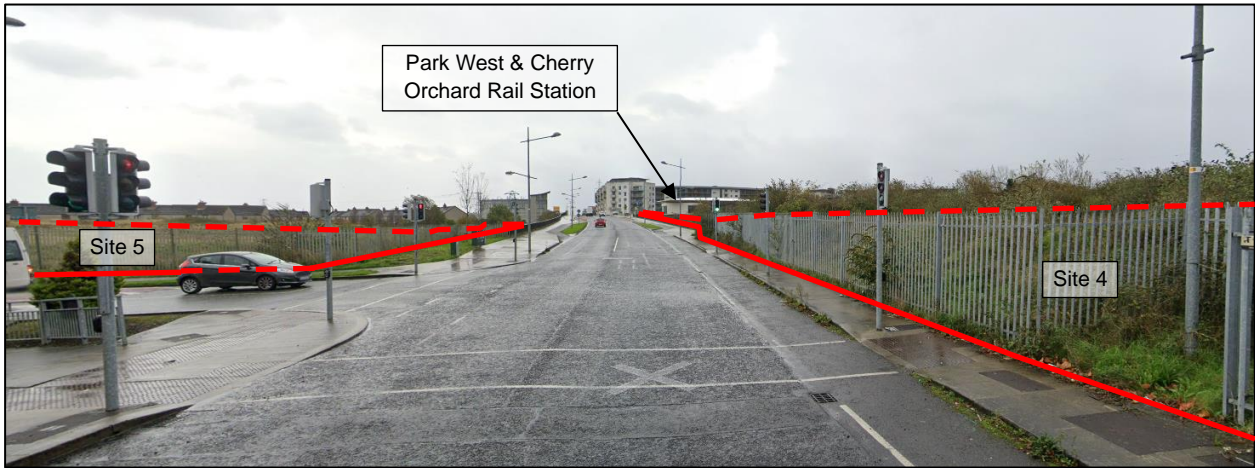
| Park West Avenue & Cedar Brook Way Junction Facing Southeast
